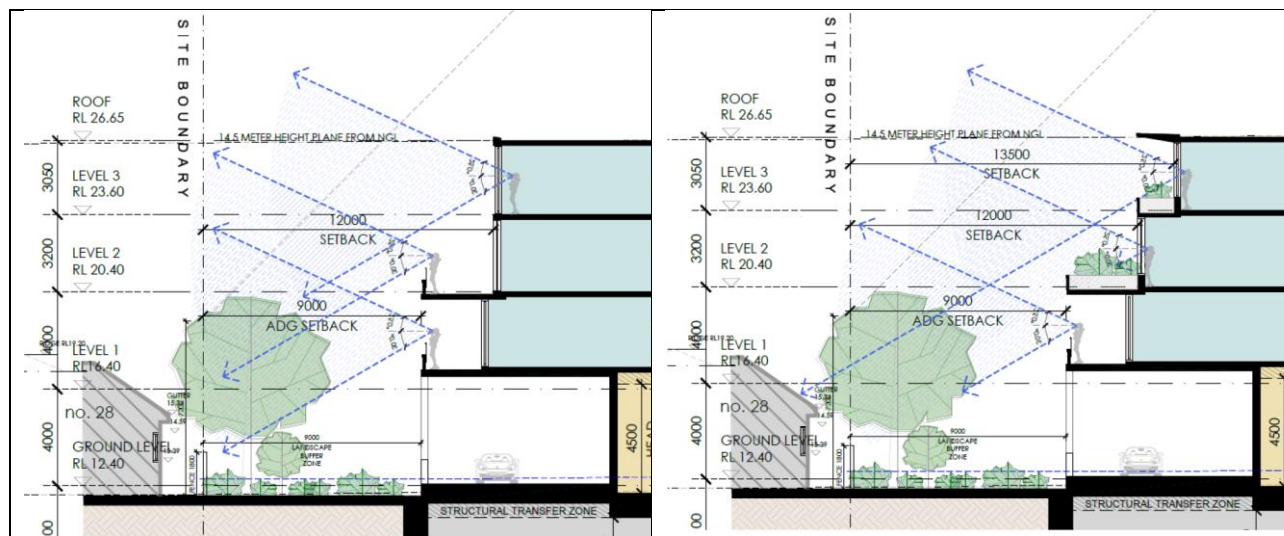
Proposed building setbacks, previous (left) and revised having considered the advice of the Woollahra LPP (right) (Source: Ethos Urban)
